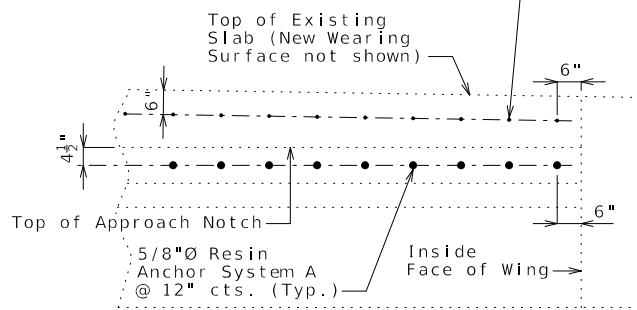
DETAILS OF APPROACH NOTCH RESIN ANCHOR SYSTEMS
